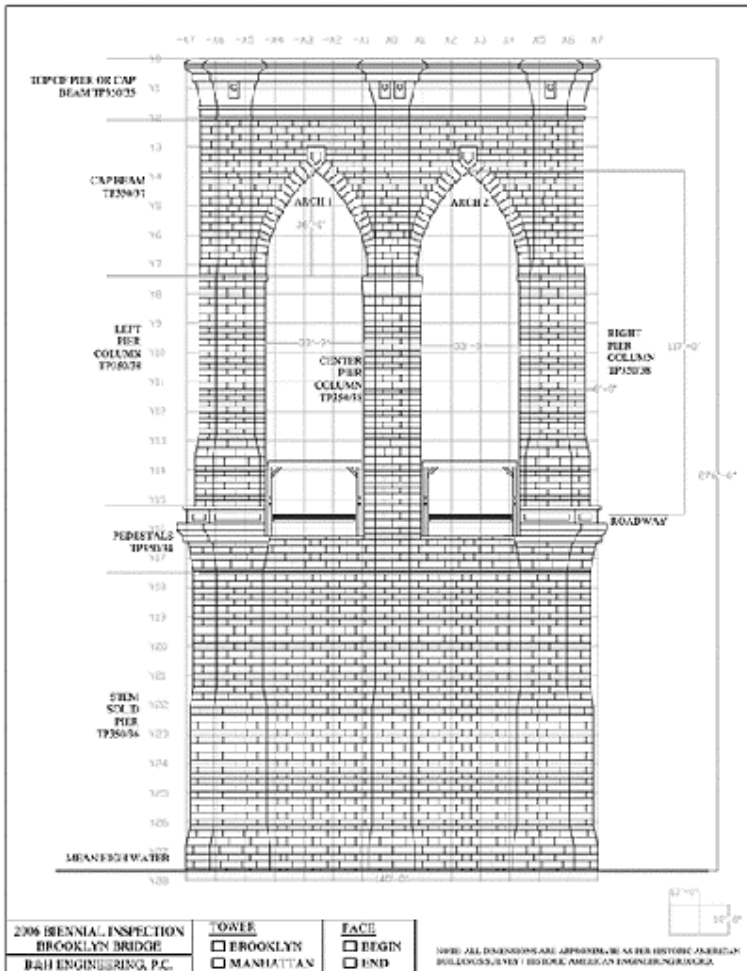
General Brooklyn Bridge Tower configuration and inspection plan.
